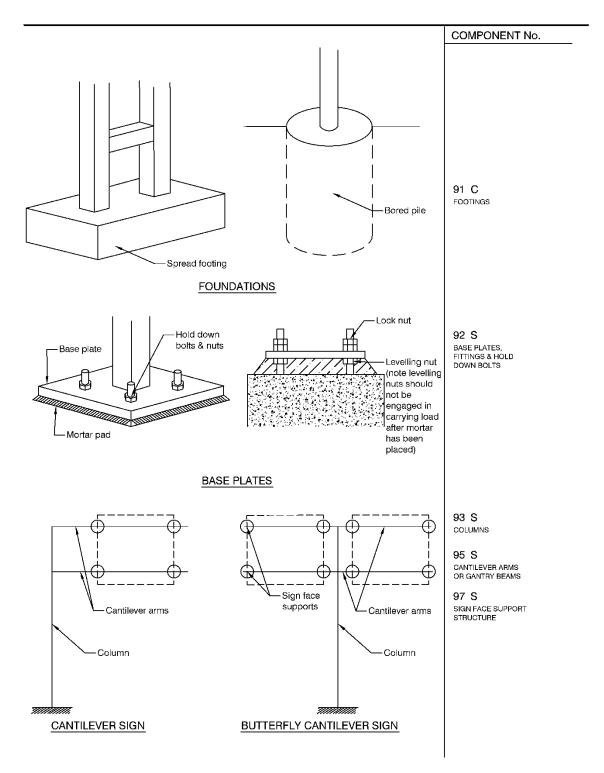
LTMS STRUCTURES. Sheet 1 of 2
